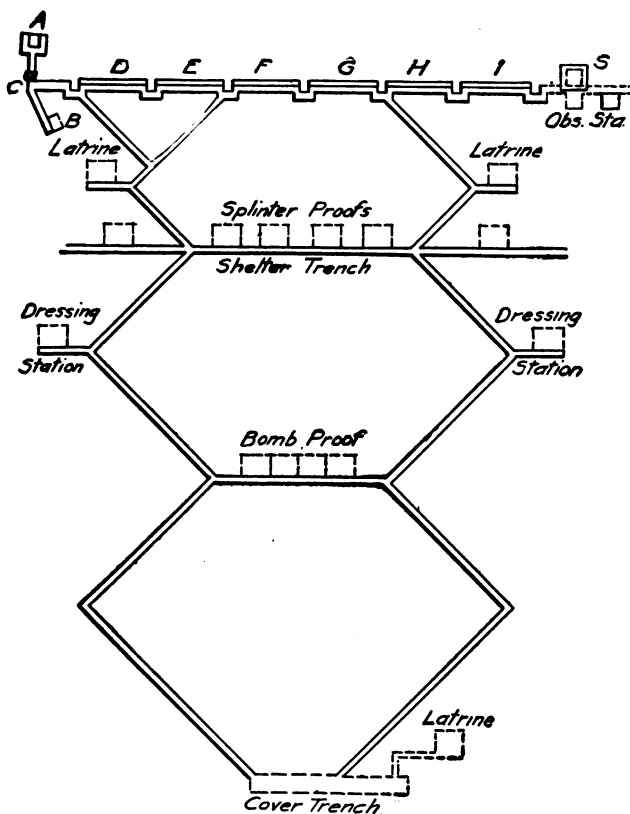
TRENCHES BUILT BY NEW YORK ENGINEERS
